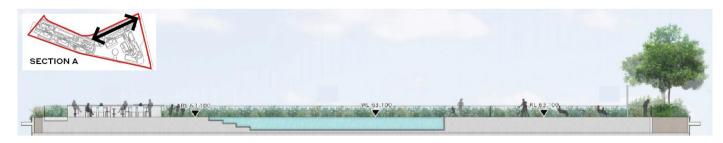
Landscape Masterplan Extract: East Tower Rooftop 'Section A'
